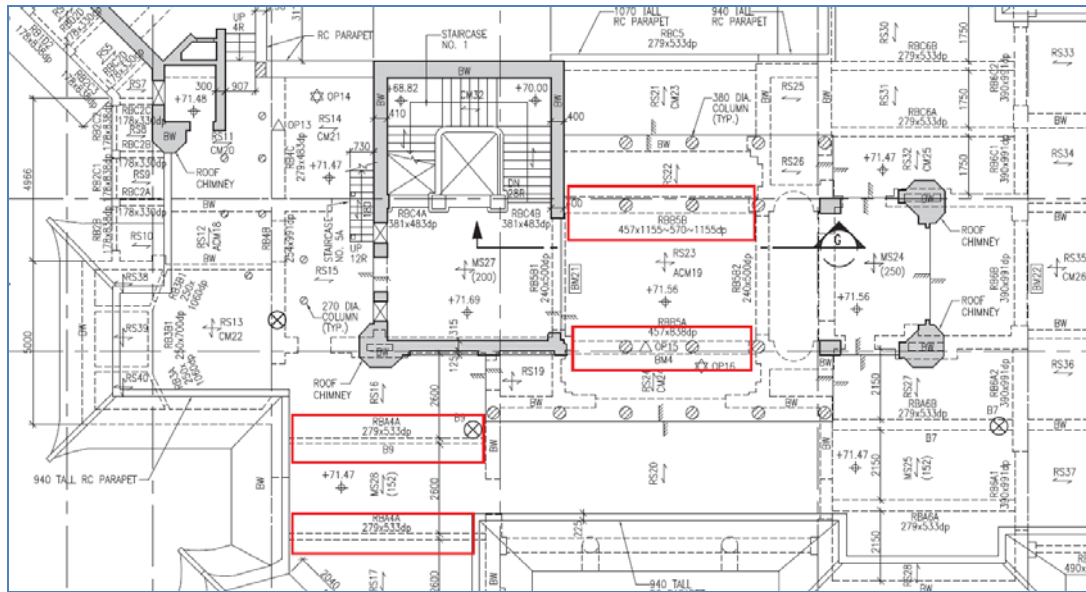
Location plan of the beams to be recast due to structural strengthening purpose.
